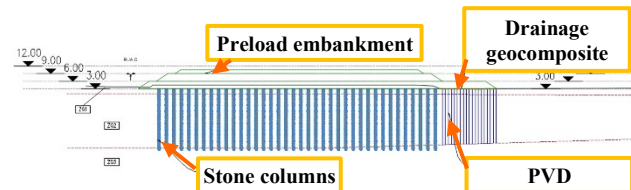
Typical cross section of the consolidation ground improvement solution (not to scale).
